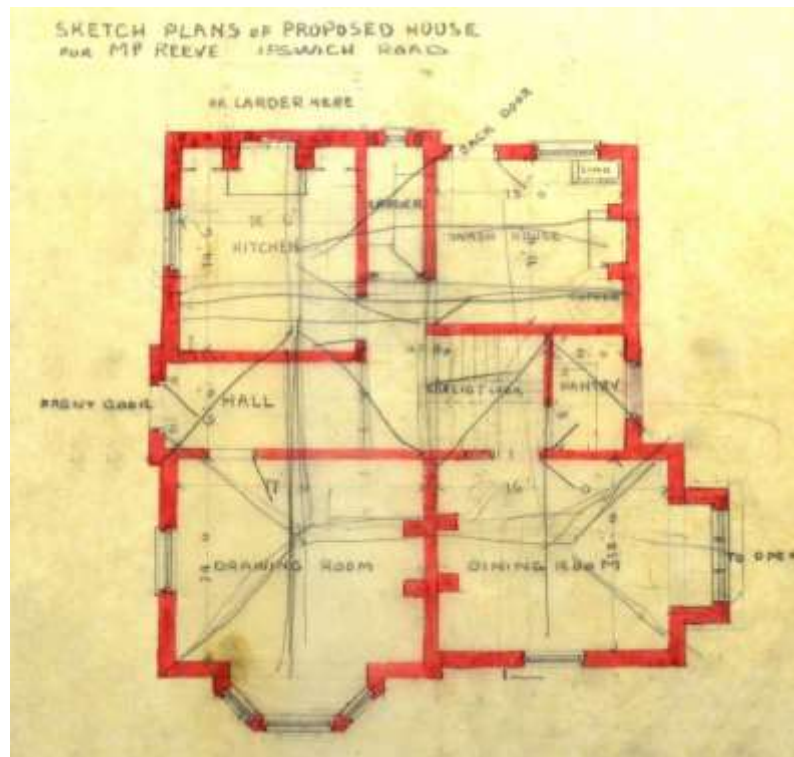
Reeve's house – side entrance plan, ground floor, 1881
